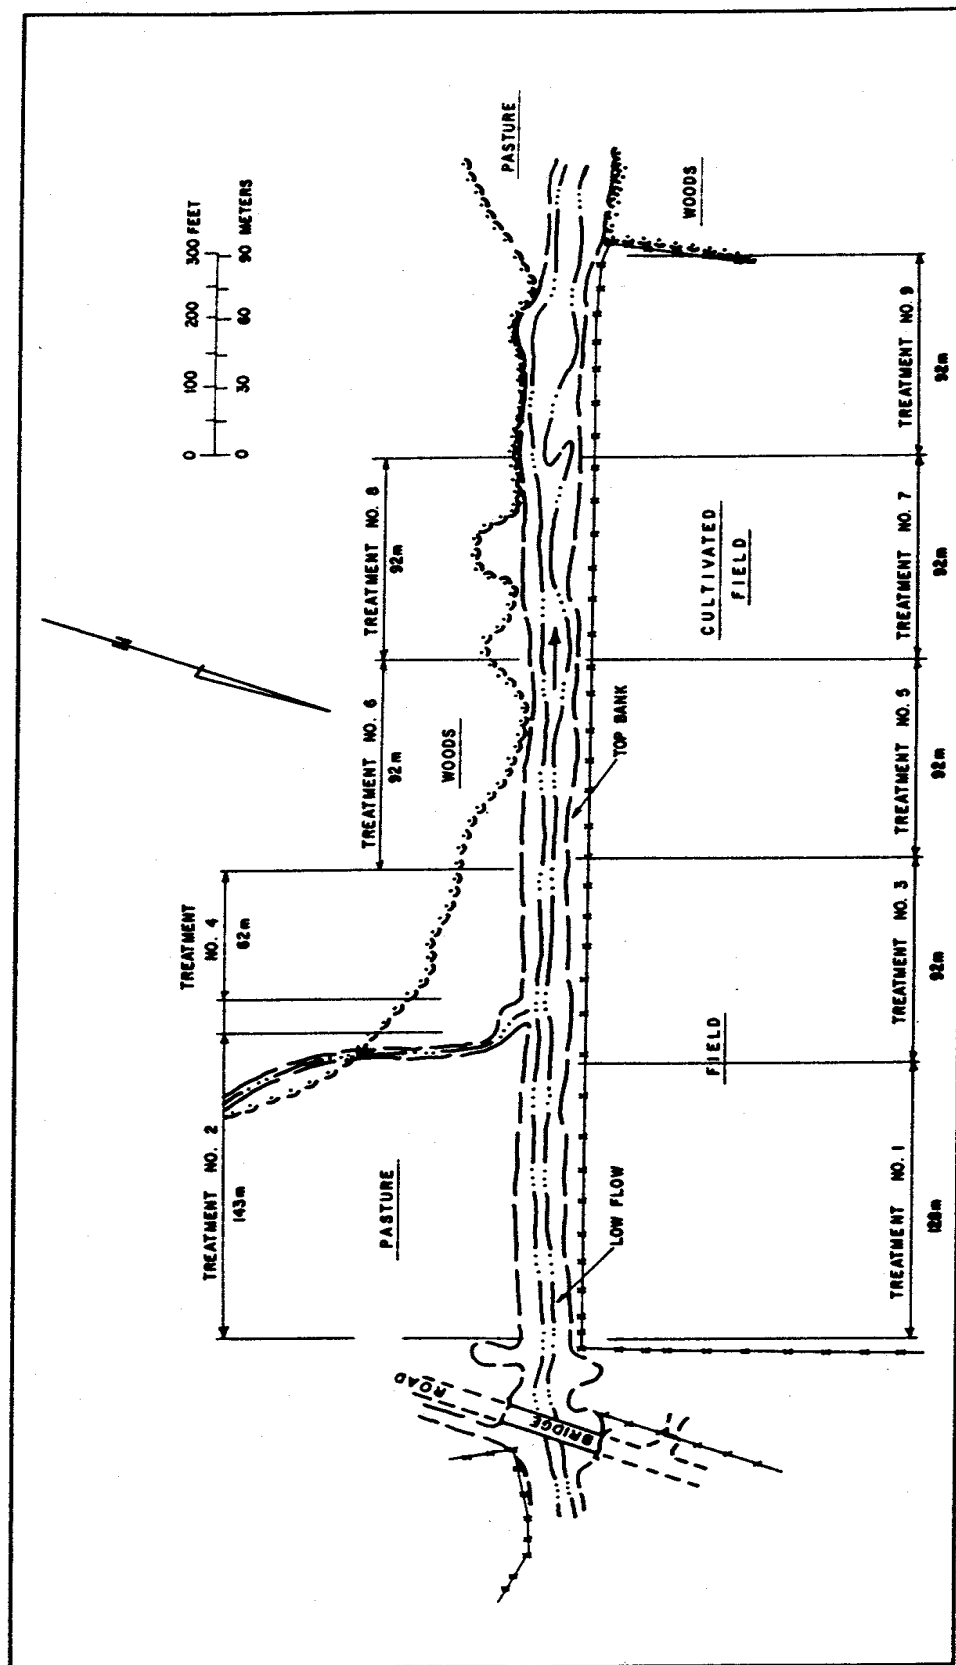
Site Plan of Johnson Creek Study Reach No. 2
